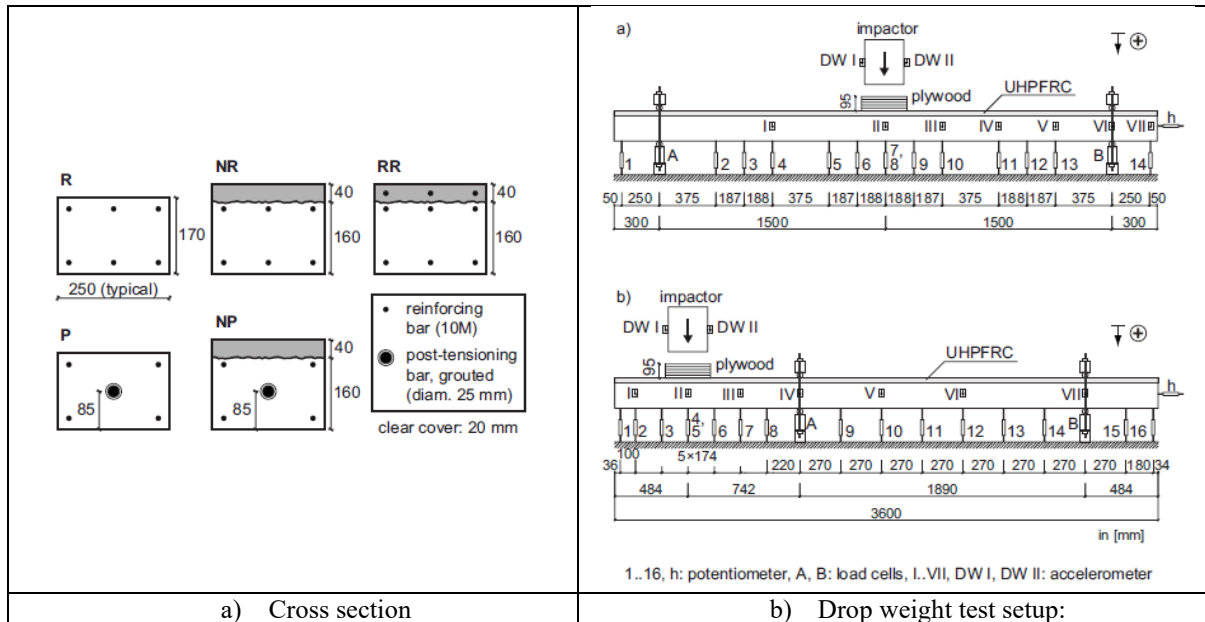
20 Cross section of specimens and test setup (Habel and Gauvreau (2009))
